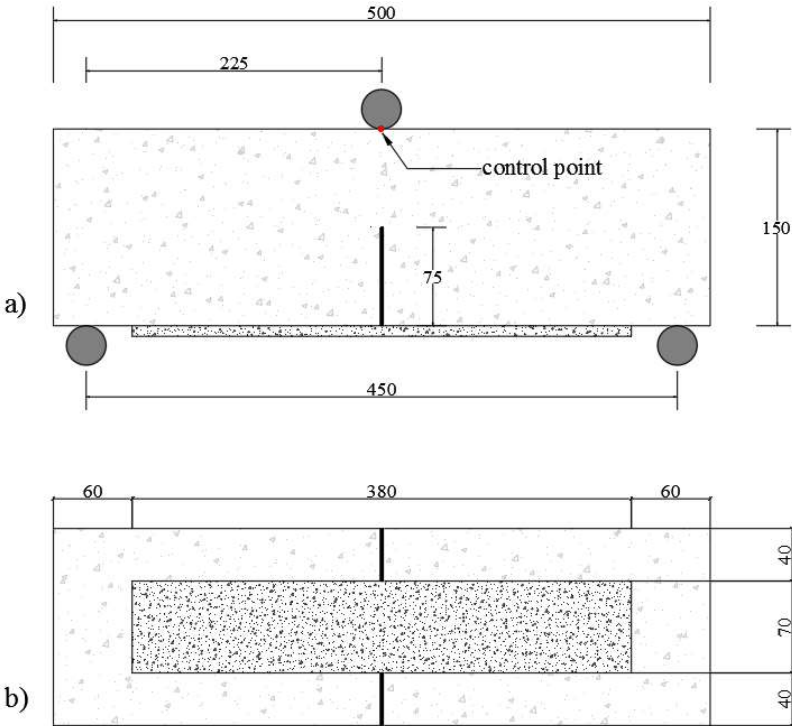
Specimen dimensions according to ASTM D7958/D7958M (2017) regulations (dimensions in mm): a) front view; b) bottom view
